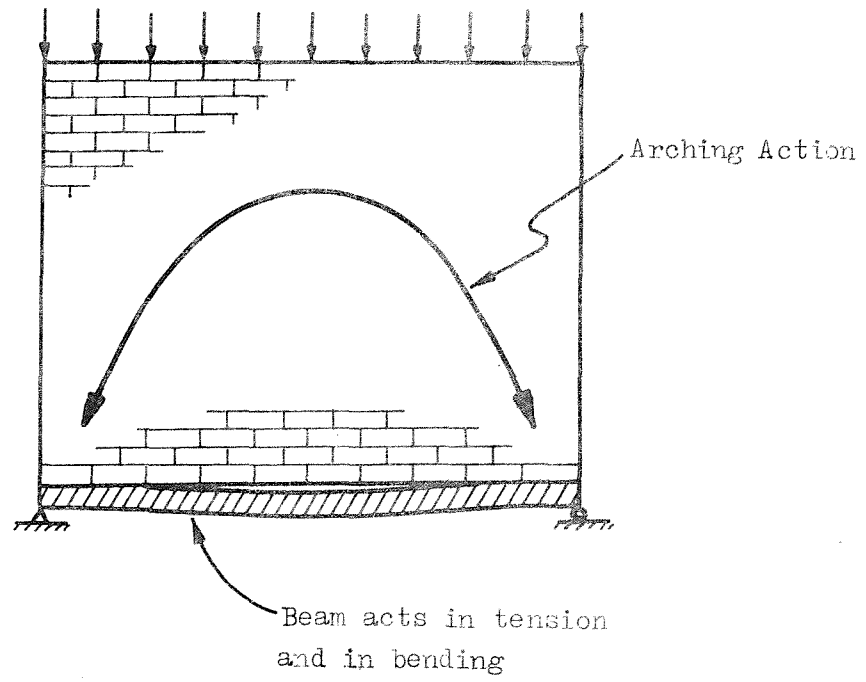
COMPOSITE ACTION OF A WALL ON A BEAM
